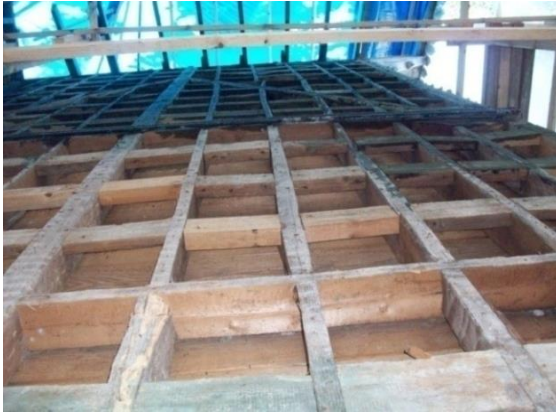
Foundation wall and posts, diagonals and floor beams standing on the base beam
